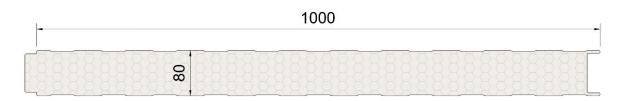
Detail drawing of the RE-SKIN roof sandwich panel with basic tongue-and-groove design [AutoCAD]
